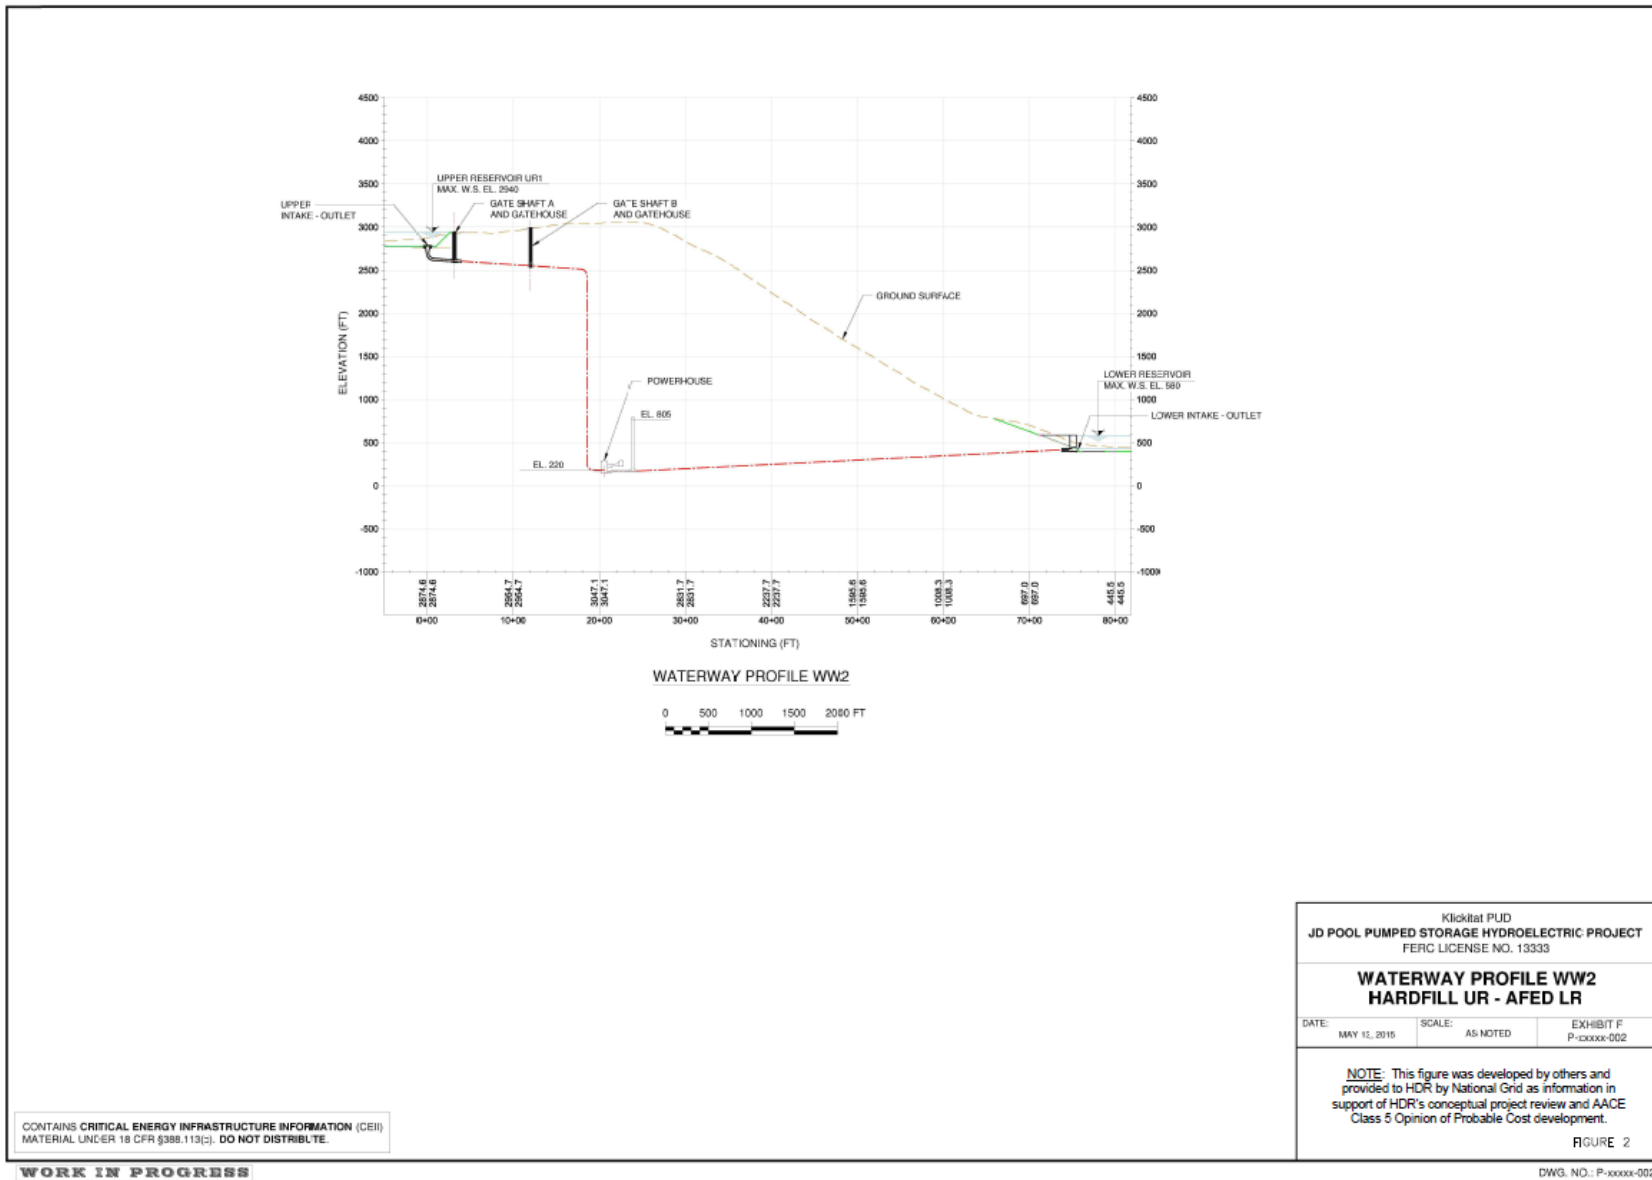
Previous Design Alternative Project General Arrangement—Profile
